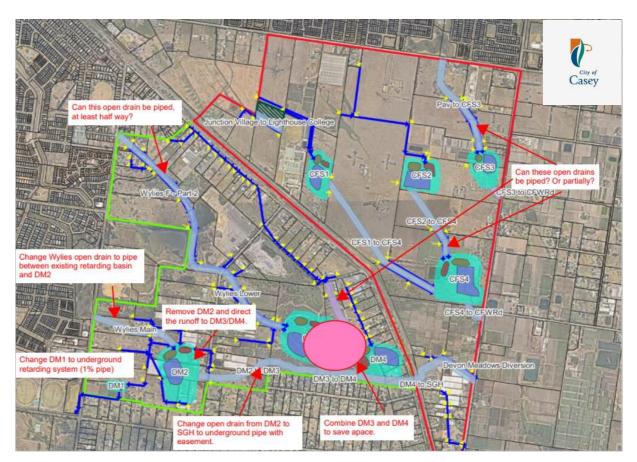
Recommended amendments to Concept Drainage Strategy Plan
